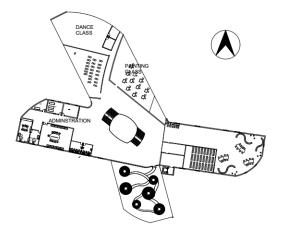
1<sup>st</sup> Floor PLAN, cultural center, student 2020
